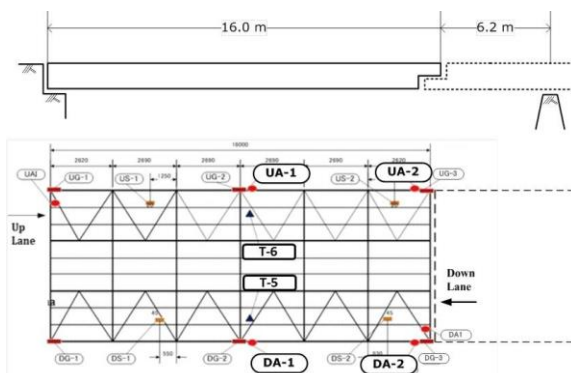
Elevation and plan views with sensor locations on the observation bridge
